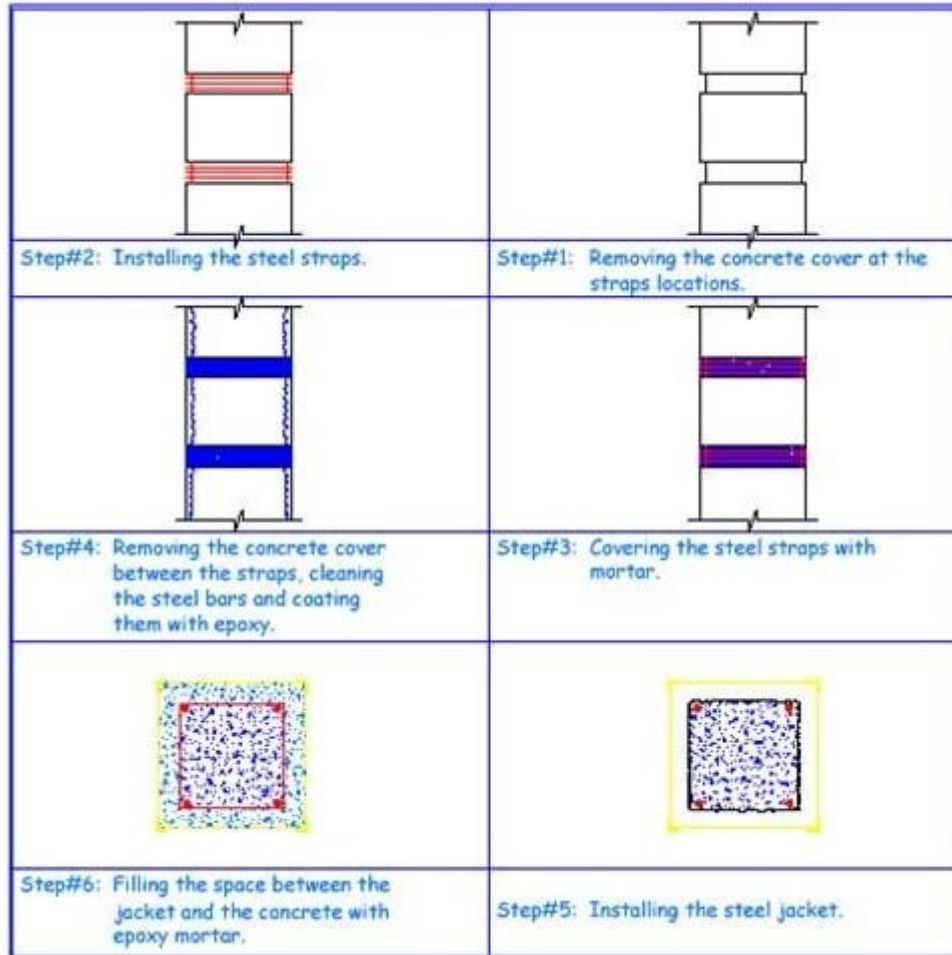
Increasing the cross-sectional area of column by steel jacketing
